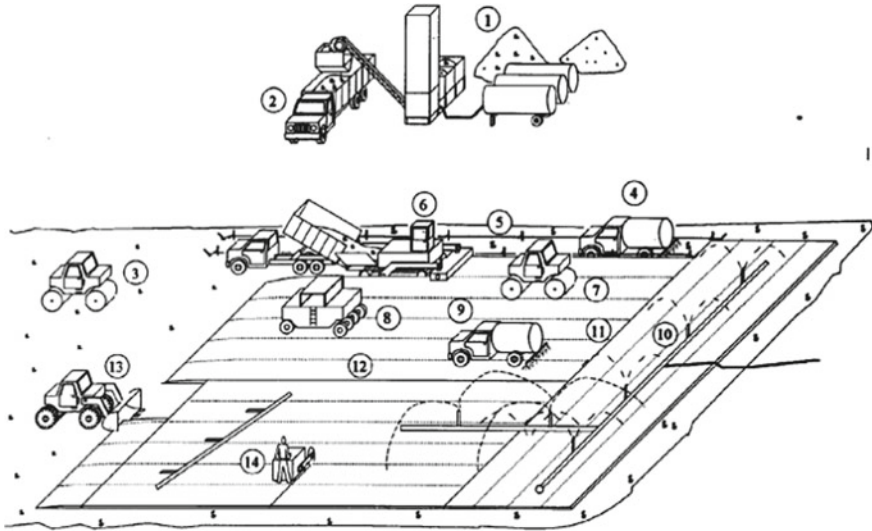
Schematic illustration of RCC pavement construction activities. Captured from Iranian guidelines for the construction of concrete roads (issue #733)
